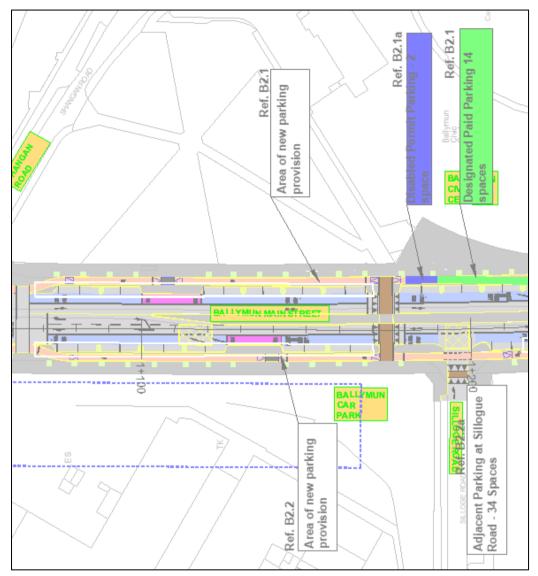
Proposed scheme design and parking changes along Ballymun Road (Between Shangan Road junction and Collins Avenue junction).
